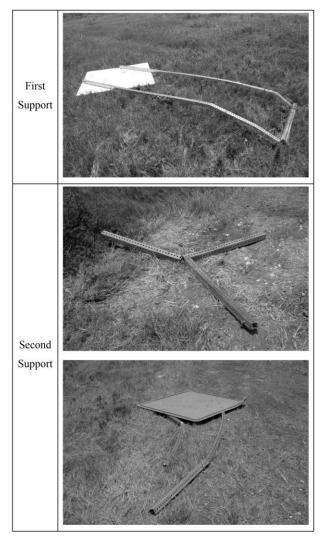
Work Zone Sign Support Test 3-71 System Damage (7)
